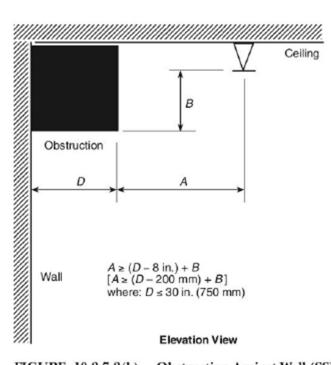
(b) Obstruction Against Wall (SSU/SSP).
